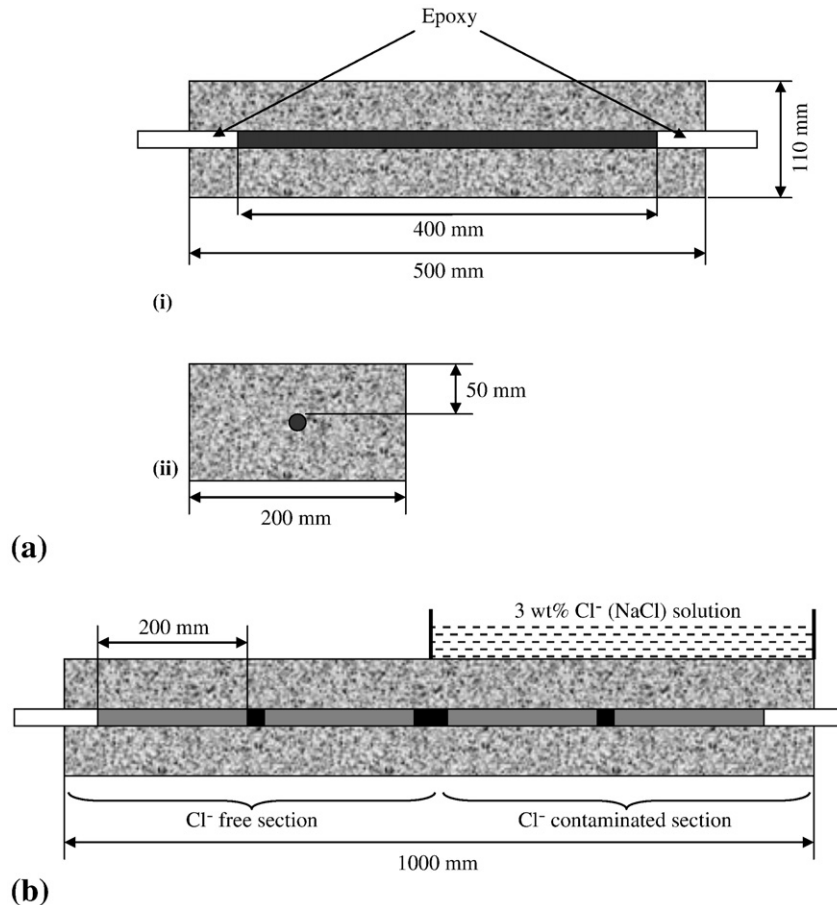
Schematic plans of (a) a concrete specimen with one steel bar: (i) side view, (ii) end view and (b) a concrete specimen with segmented steel bars with the same end view as shown in (a)-ii.
